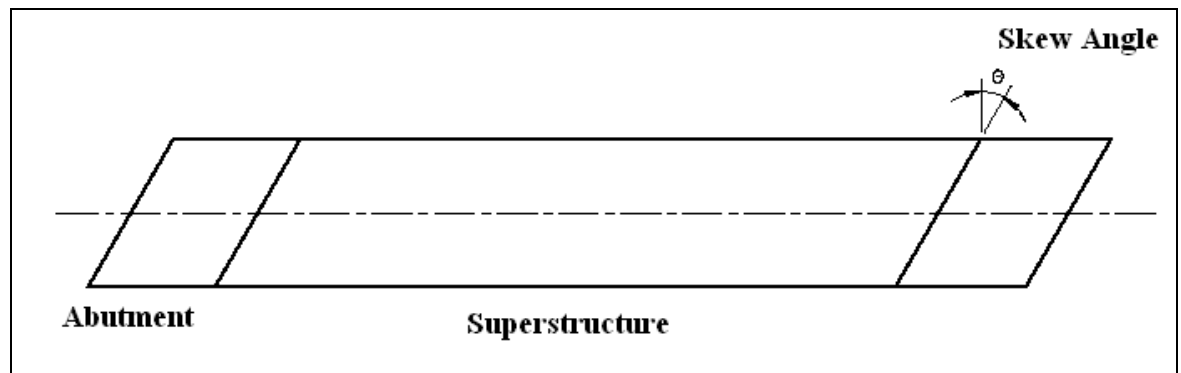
A plan view of a skewed integral abutment bridge. (Modified from Oesterle and Lofti, 2005)
